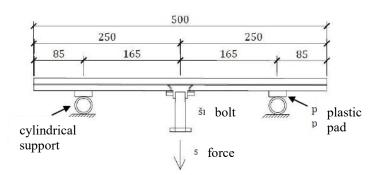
Scheme of the tensile tests arrangement (Zdražilová 2019).
